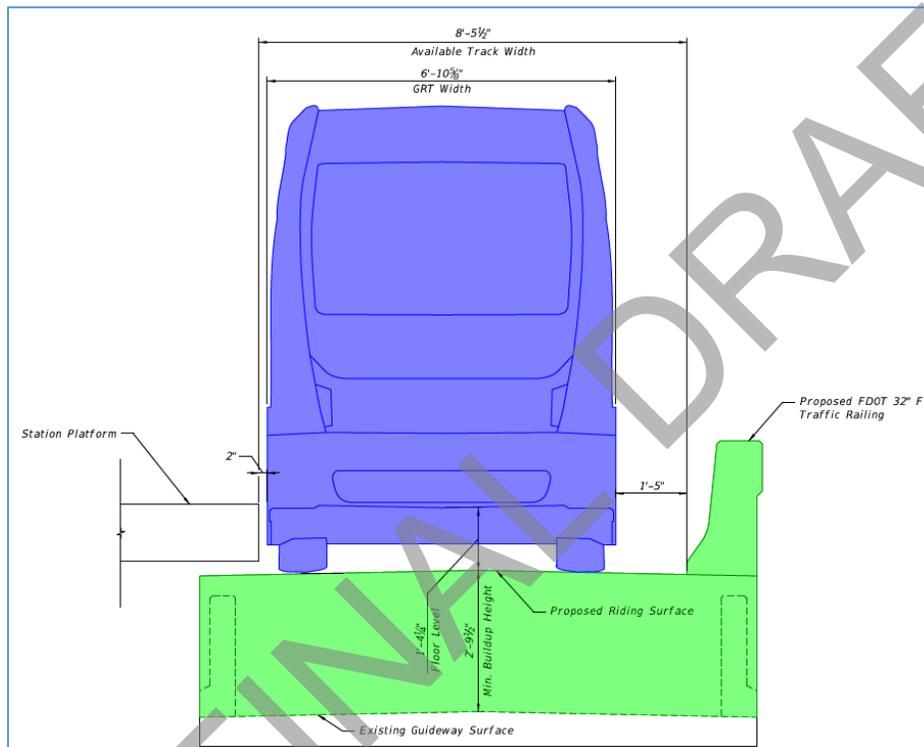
TYPICAL CROSS SECTION AT STATION PLATFORM
